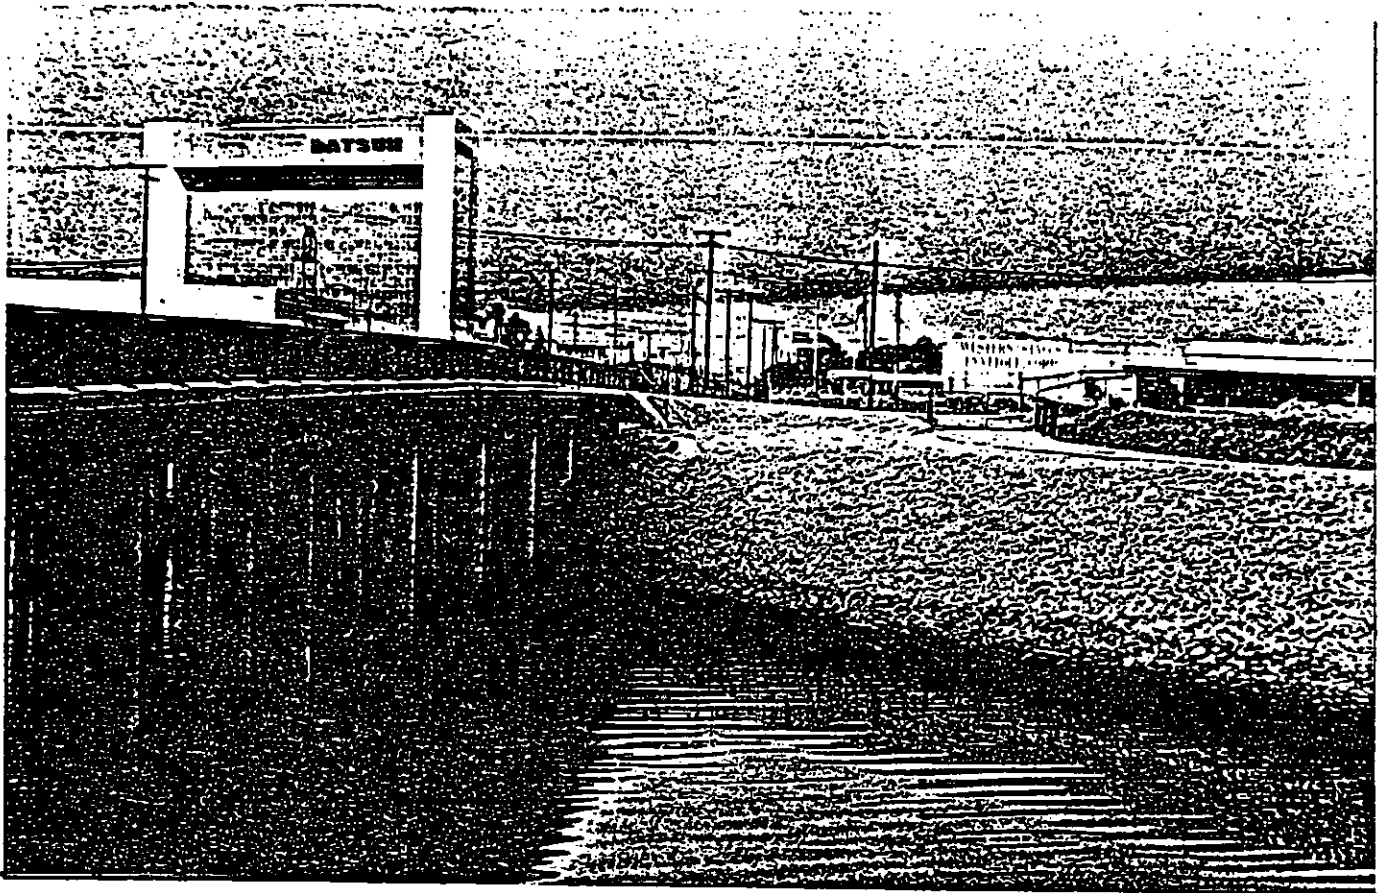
PHOTO G -- LOOKING NORTH ALONG FIGUEROA STREET BRIDGE. SITE IS LOCATED TO RIGHT.
